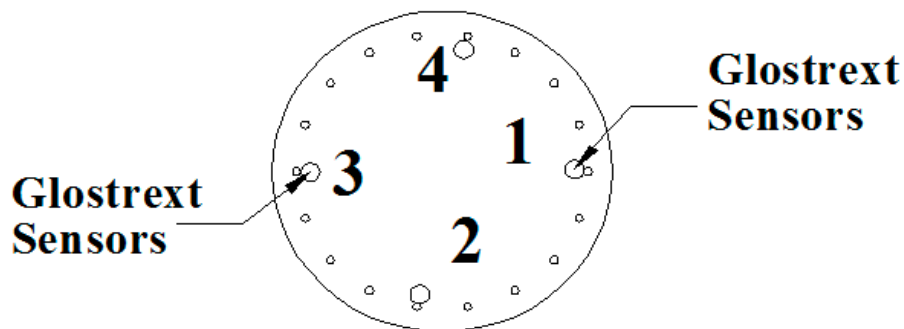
Cross-section of BP# 1 (D = 1,800 mm) and BP# 2 (D = 1,000 mm).
